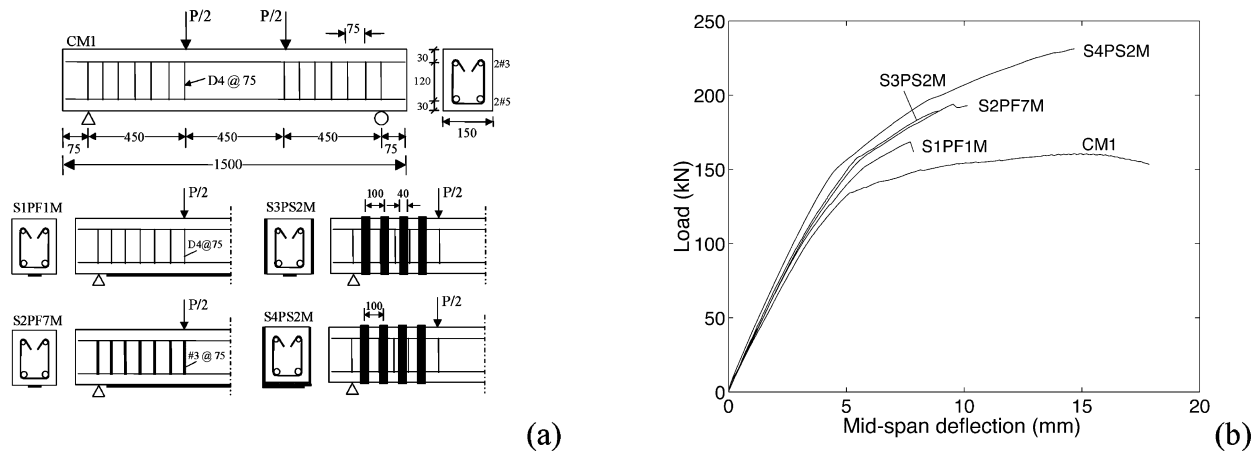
Influence of shear strengthening and anchorage on strengthened beam behavior under monotonic loading.
